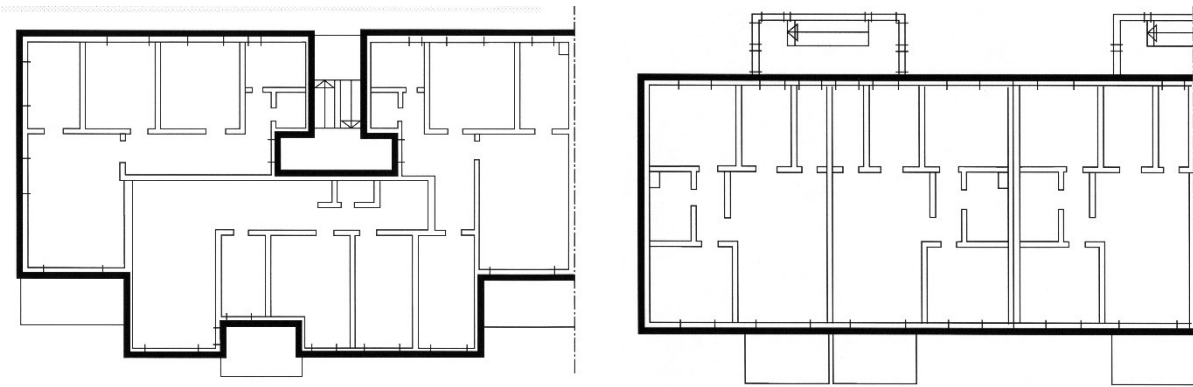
Drawings of half of the floor plan of the multi-family house in Stuttgart Stammheim according to first and second design [84].
